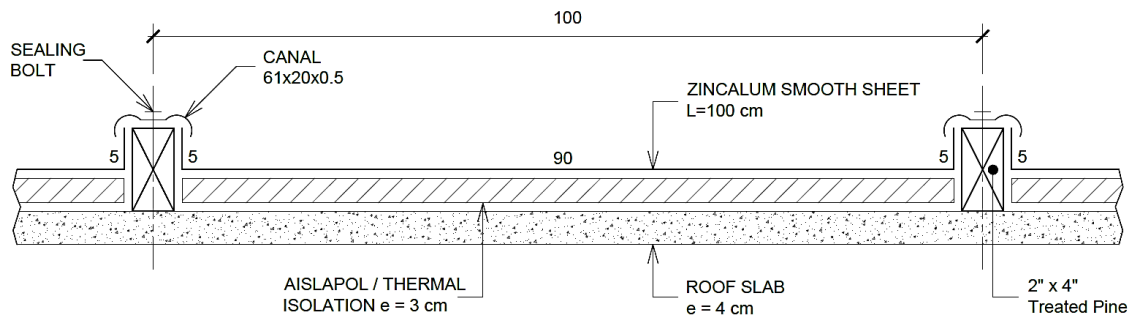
Roof thermal isolation and finish detail elevation (units in cm).
